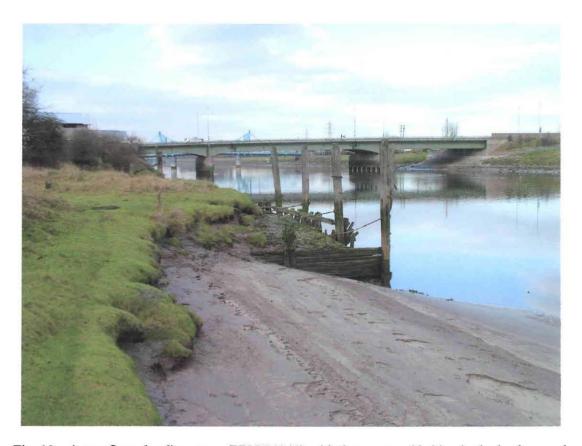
Aston Quay landing stage (PRN 34240) with the new road bridge in the background. Photo CPAT 2079-018
